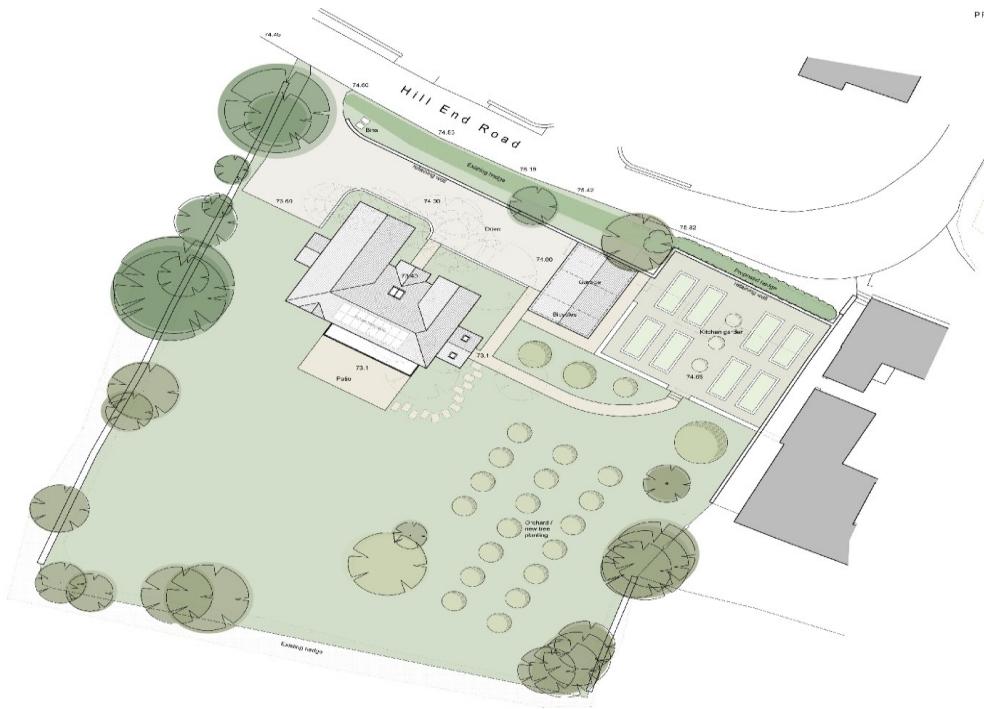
Site Plan showing proposed new build within the grounds of the demolished Farmhouse – Hill End Farm, Mapplewell, S75 6DU.
